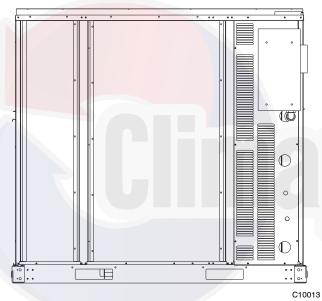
Mounting Position for Field Disconnects (up to 100A)
